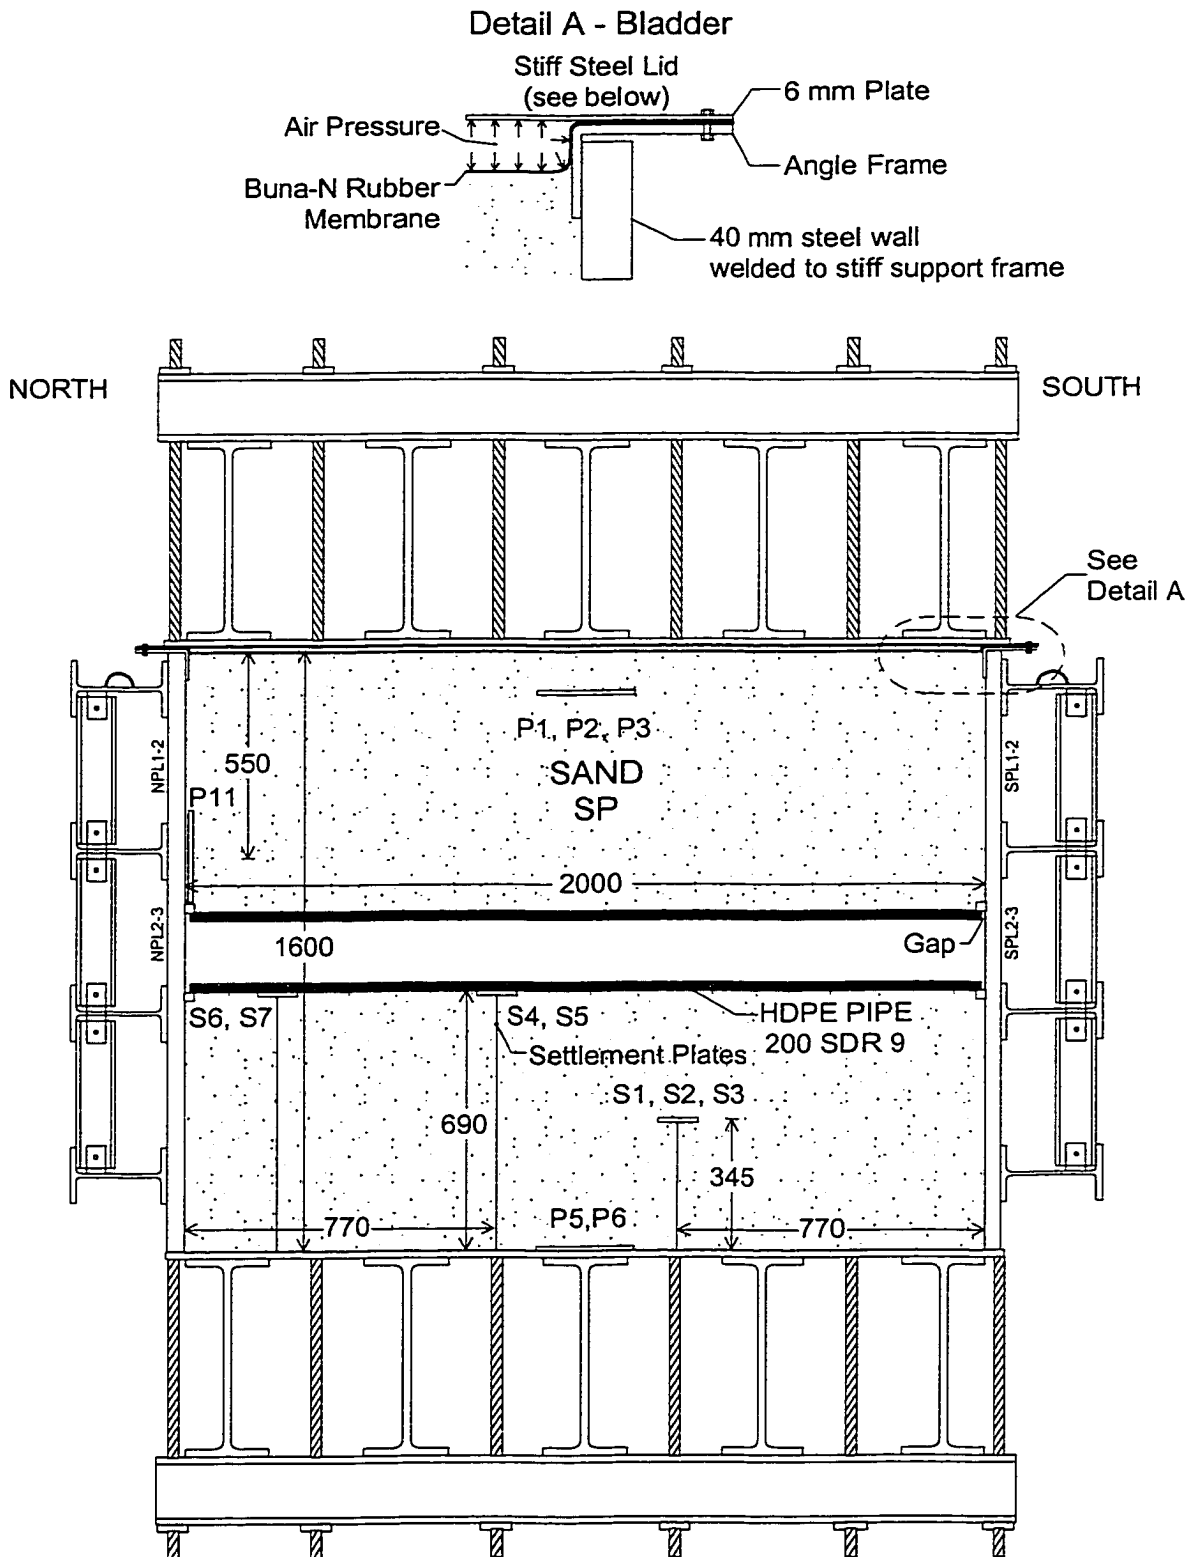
Longitudinal section through pipe test facility showing the soil, pipe and instrumentation used for test P2a. (Dimensions in mm).
